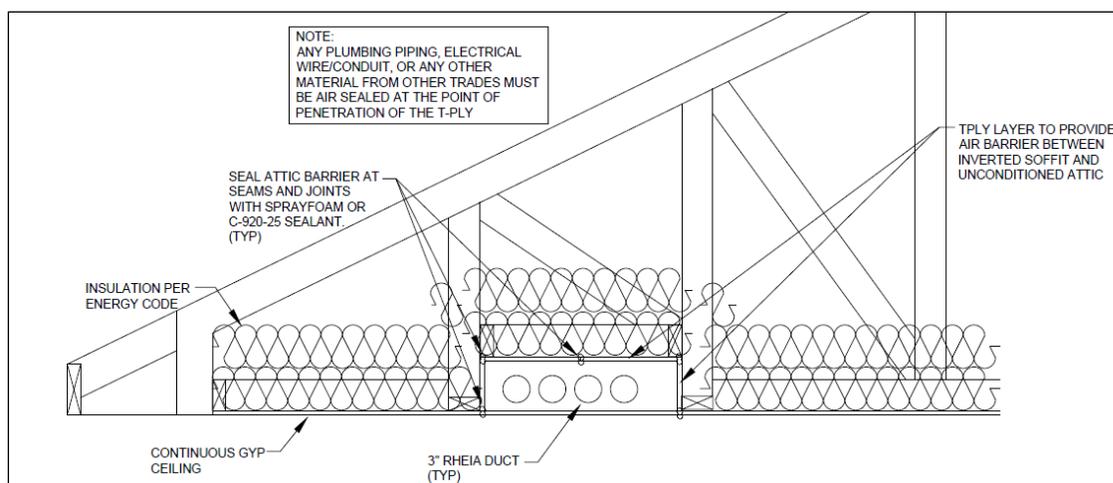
Detail for an inverted soffit running across bottom chords of the trusses.
